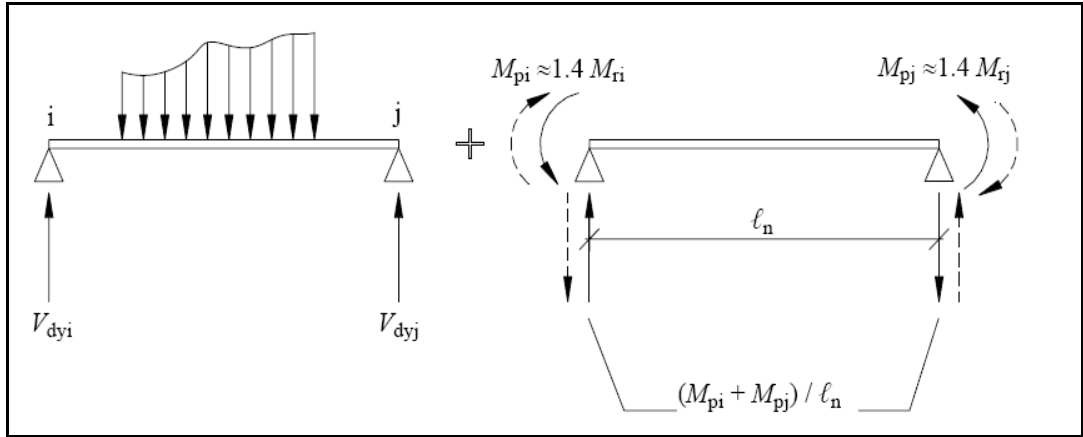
Calculation of Shear Force Carried by a Beam (V_e) [1]
